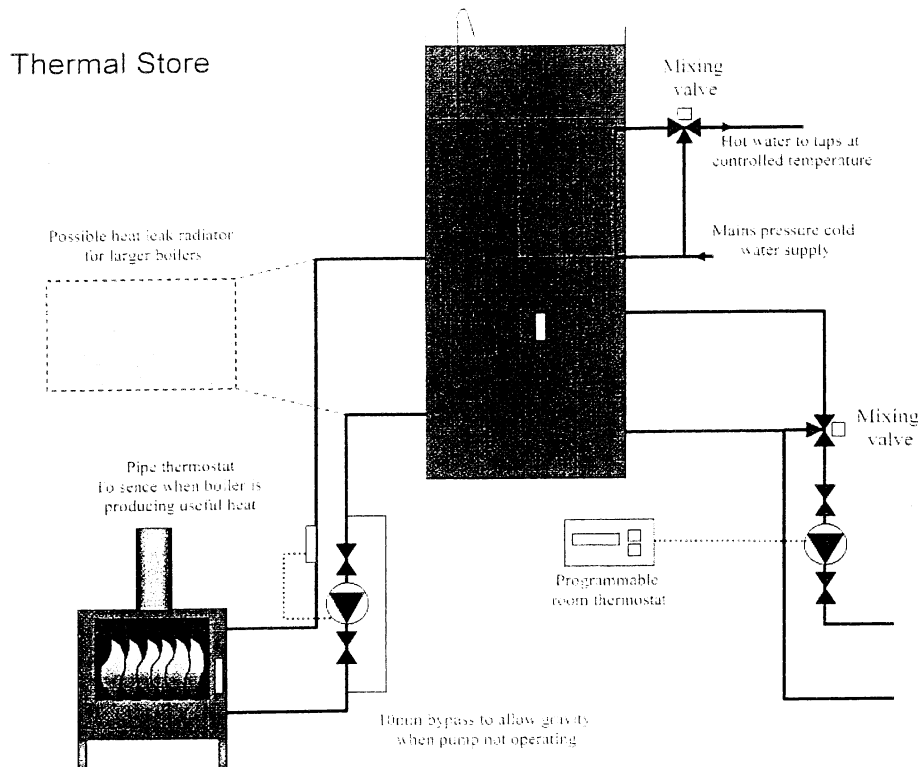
shows a typical installation incorporating a manufacturers control "kit".
